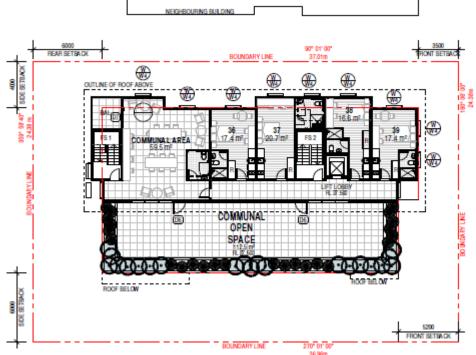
Original Level 3 floor plan, which has been deleted under the amended proposal.
